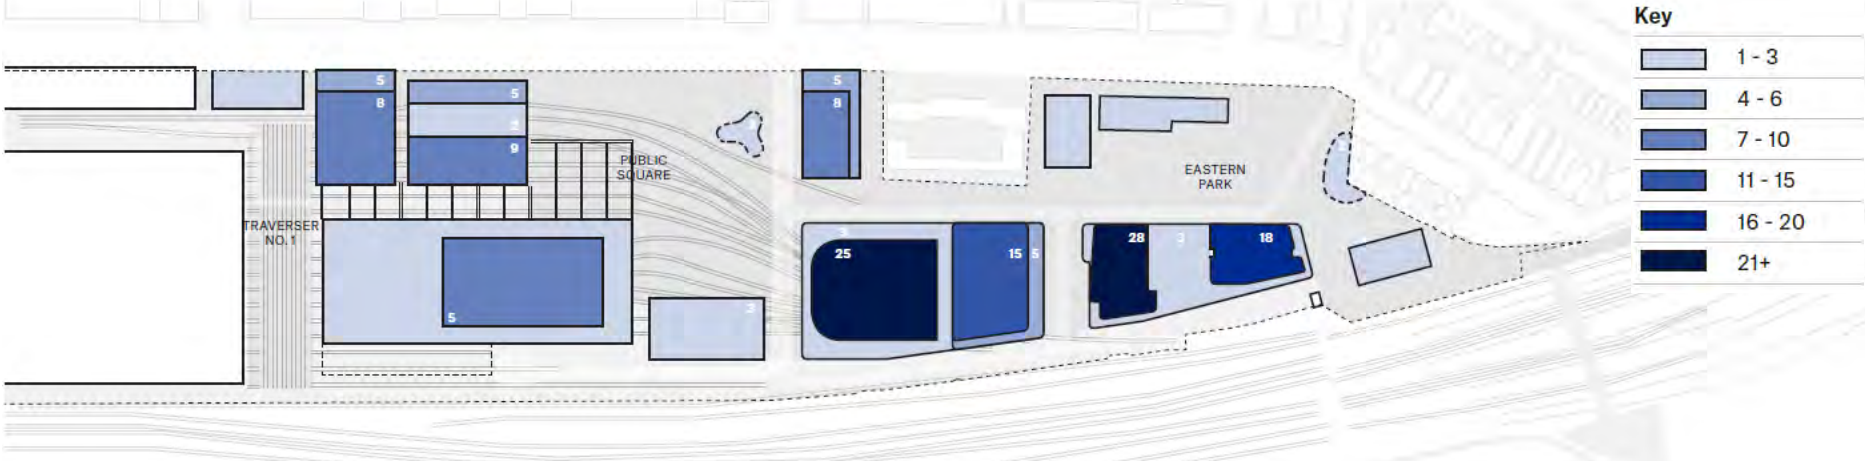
Building heights plan (Source: Bates Smart 2022, Rev E, April 2022)
